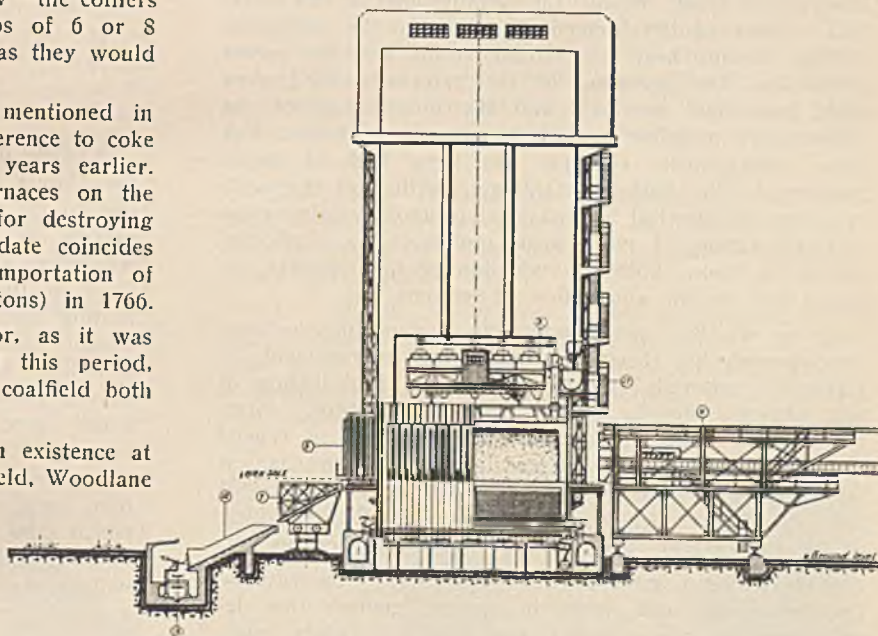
Elevation and Part Section of typical Modern Coke Oven.
